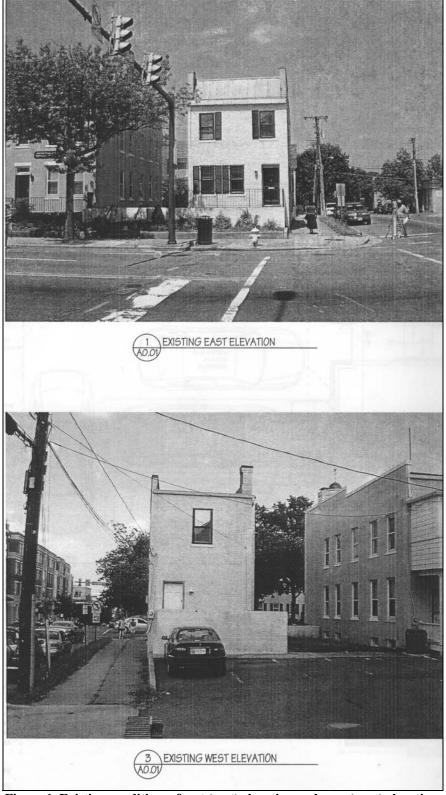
Existing conditions: front (east) elevation and rear (west) elevation.
